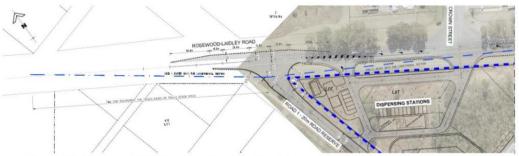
New Road (1) / Rosewood Laidley Road Intersection Visibility Assessment - West
